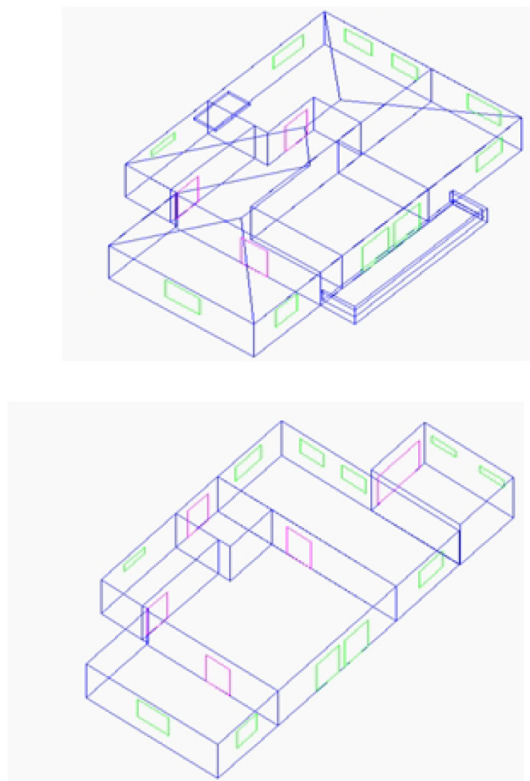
Image showing the structure of the 3D model and the two floors of the building. This image illustrates the process of creating the structure of the model by using series of rectangular blocks to develop the final shape of the building. The ground floor of the building is represented on the bottom image while the top floor and the roof on the top image.
